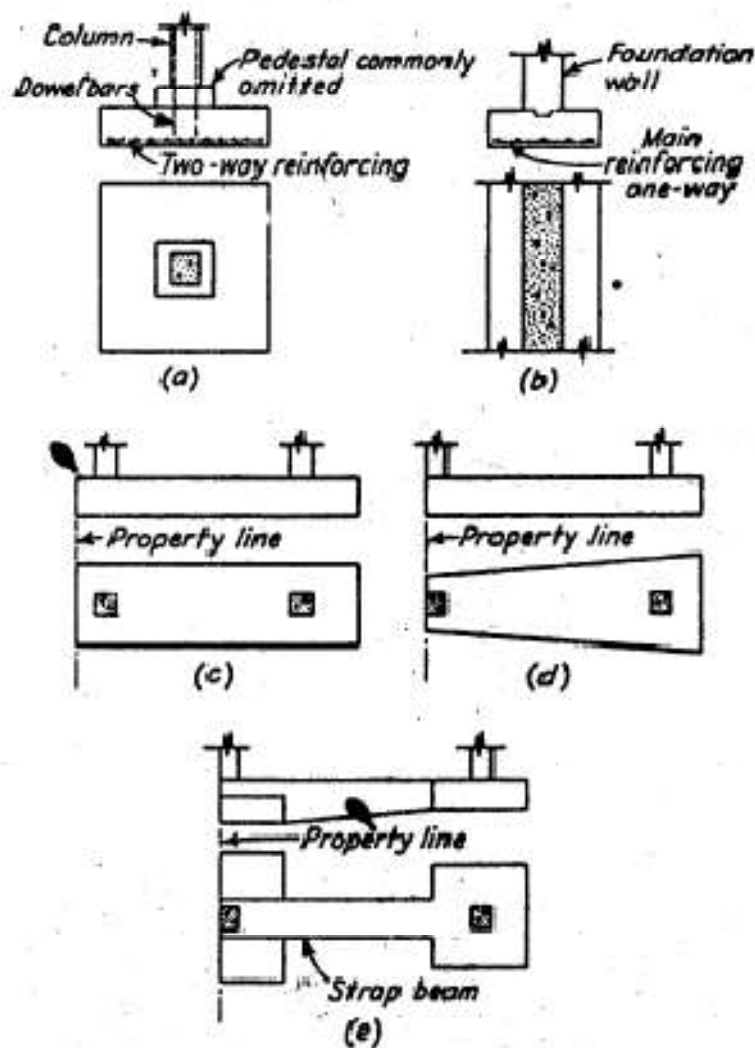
Types of footings. (a) Individual column footing. (b) Wall footing. (c) and (d) Combined footings. (e) Cantilever footing.
